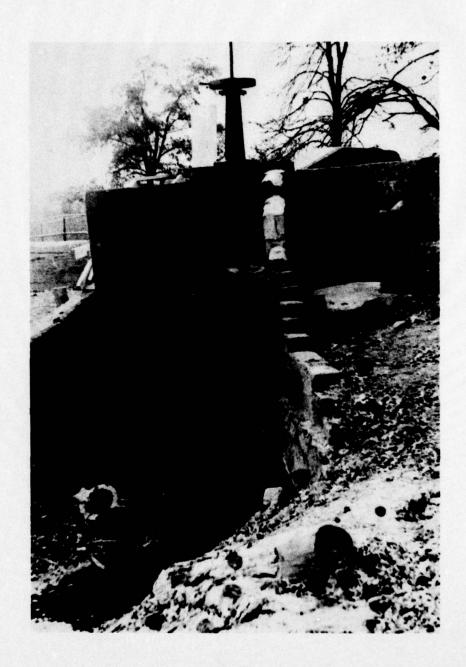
Photo C View of intake to outlet works looking downstream (Oct. 28, 1973)
